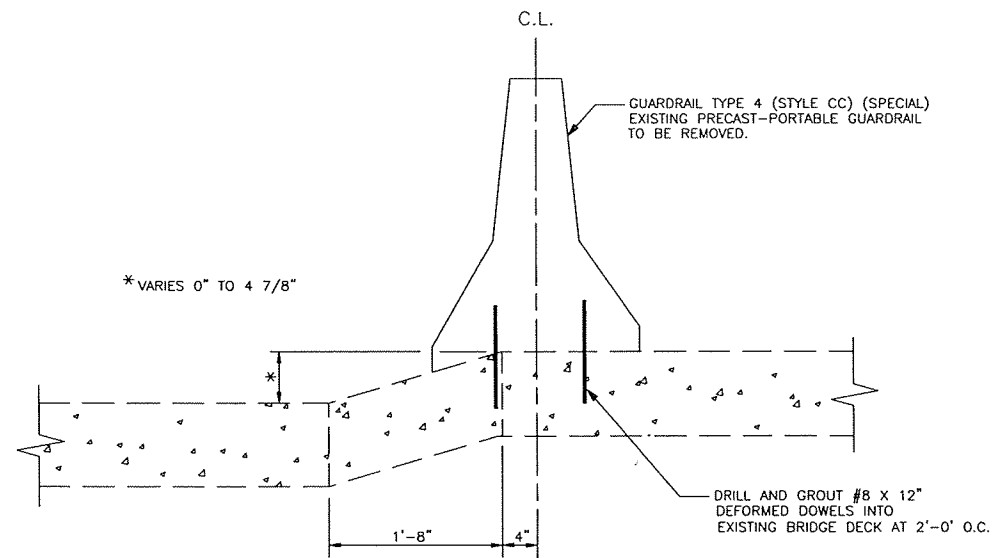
DETAILS OF GUARDRAIL TYPE 4 (STYLE CD)
